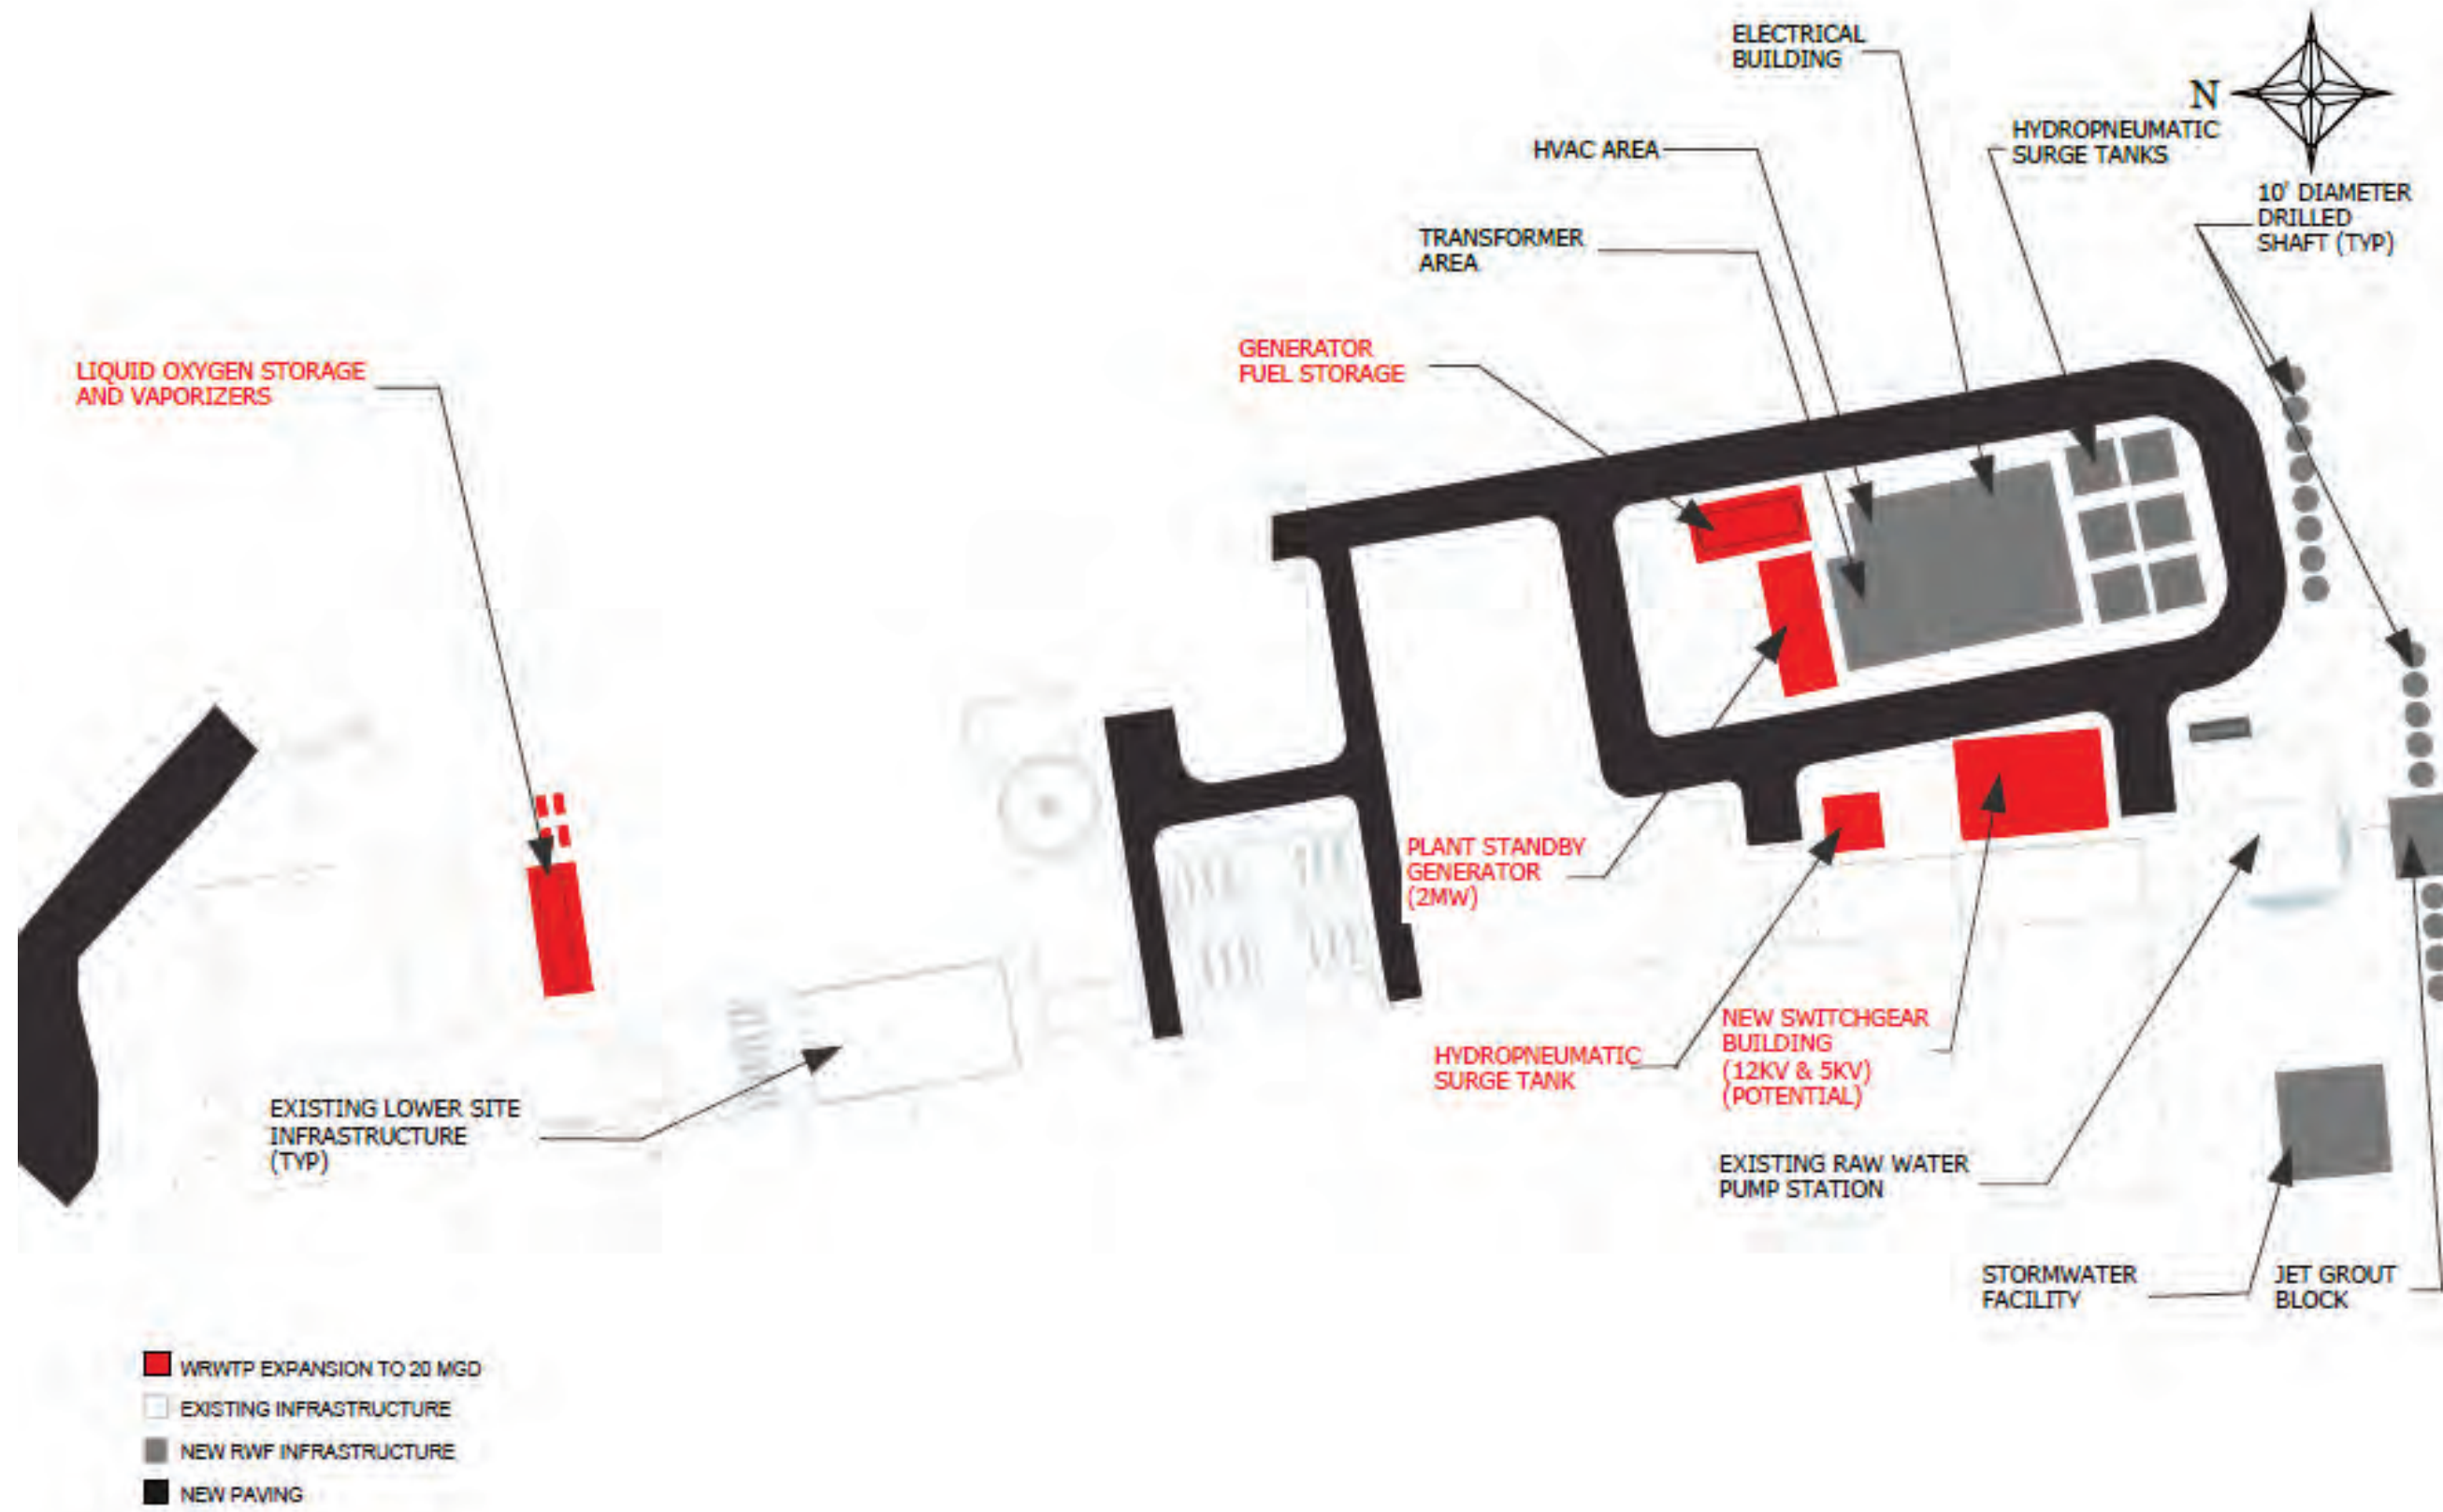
Site Plan – 20-MGD Capacity Expansion
